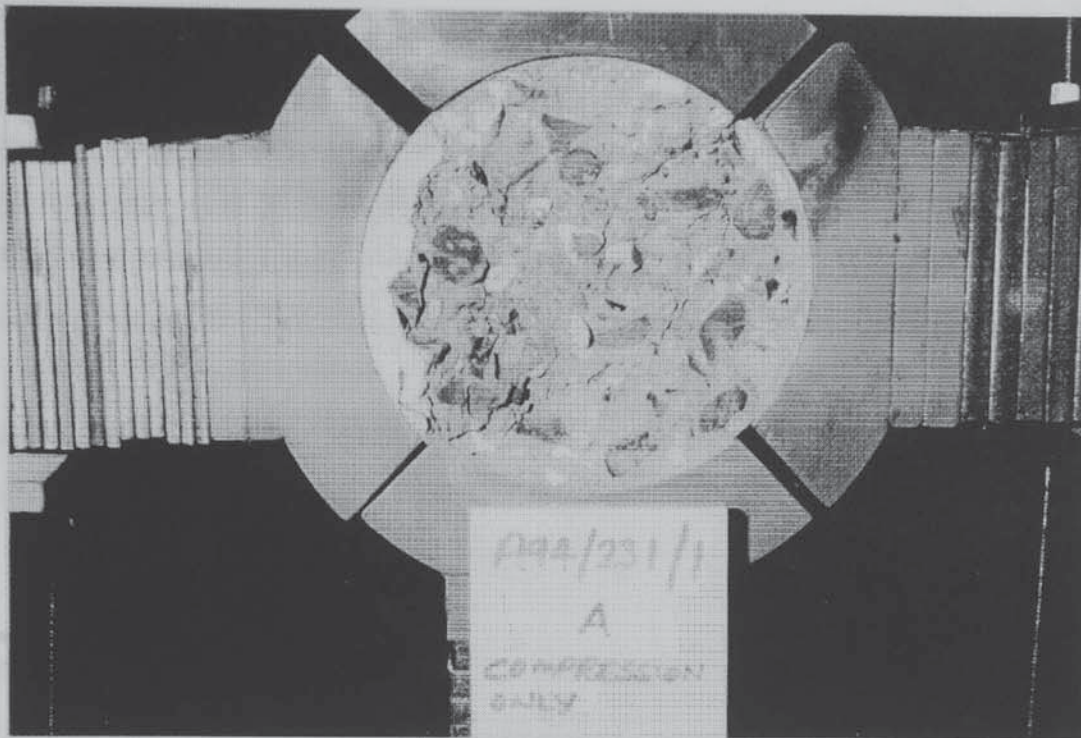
Failure modes of concrete specimens in test rig at ambient temperatures loaded in both vertical and horizontal directions
